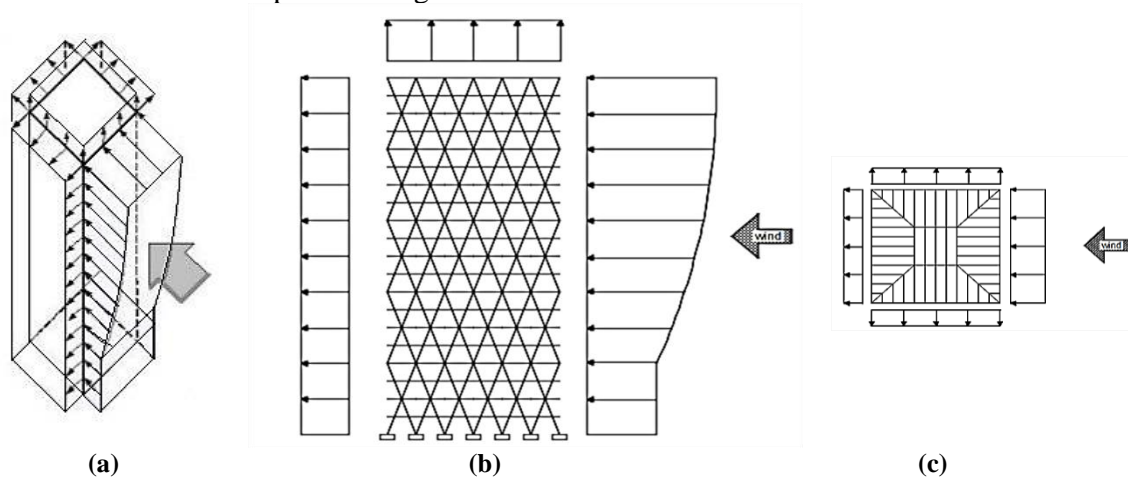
Typical wind loading profile: (a) 3D view, (b) side view and (c) plan view
